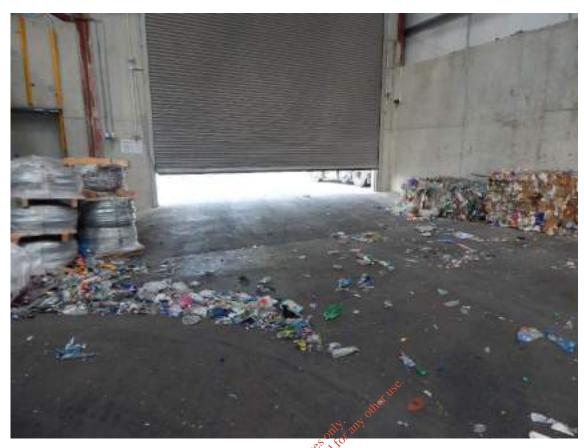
MRF Building: Fire Water Retention Ramp into and Out of MRF Building
